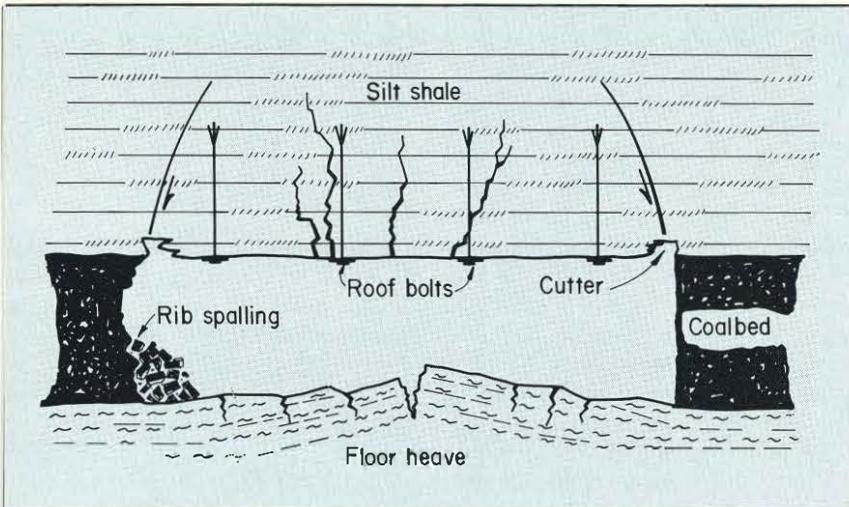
Subtype S_3 roof failure attributed to mining induced stress.
